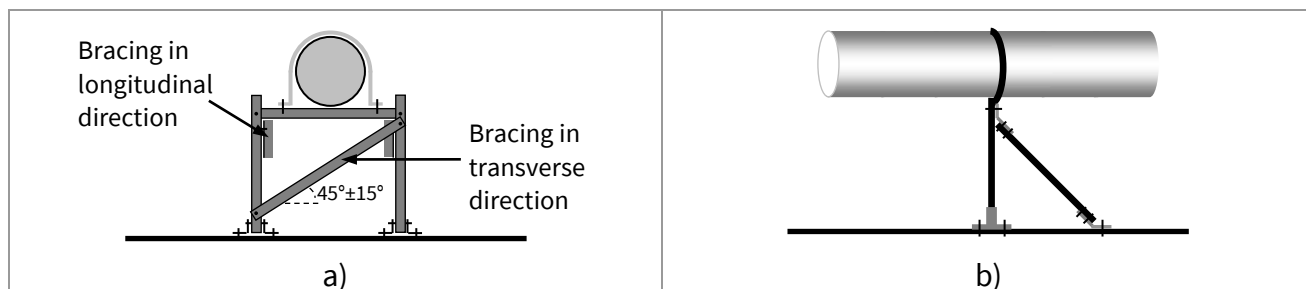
Positioning of bracing a) in transverse direction and b) in longitudinal direction for elevated pipes and (cable) ducts
